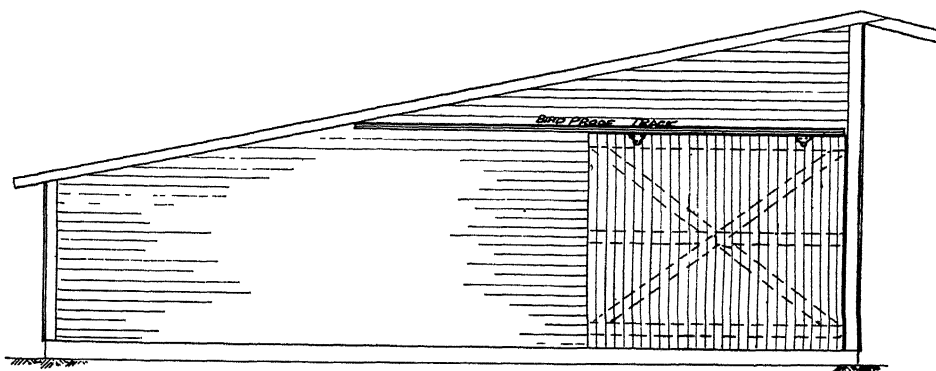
End elevation. The 8-foot door should be placed in the end opposite the feed room. This door allows a team to be used in cleaning out the house. Plans for other end of house are shown on next page.
